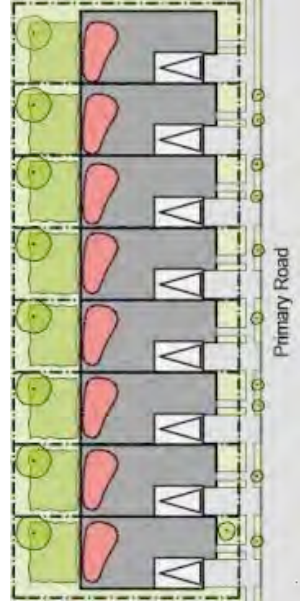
Multi-Dwelling Housing (Terraces) with garages facing the street (MDDG, p99)
